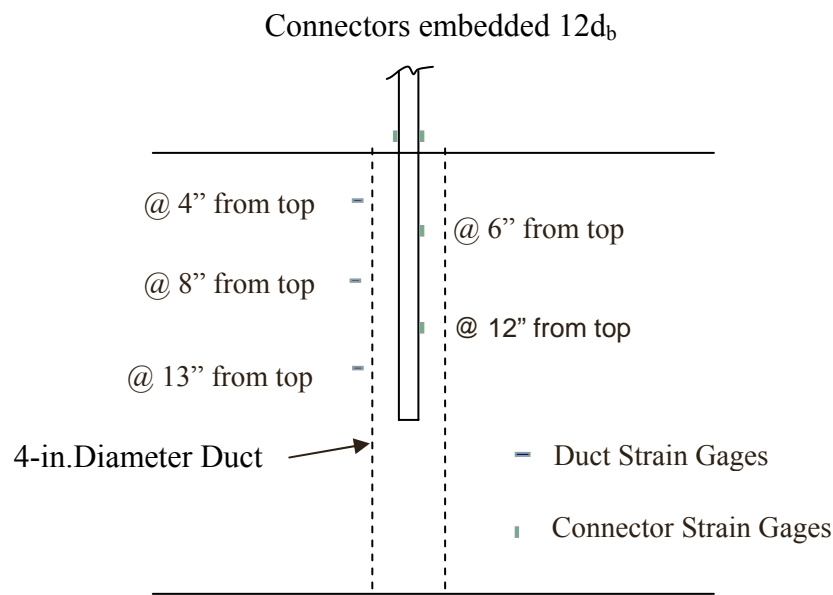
Typical Strain Gage Locations on Connectors and Ducts
